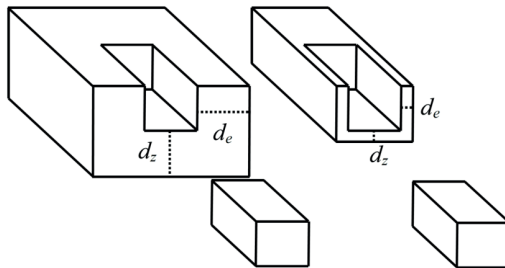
Failure plane loading concept for block tear-out leading to the first assumption (same block torn-off but different failure plane loading)[6].
